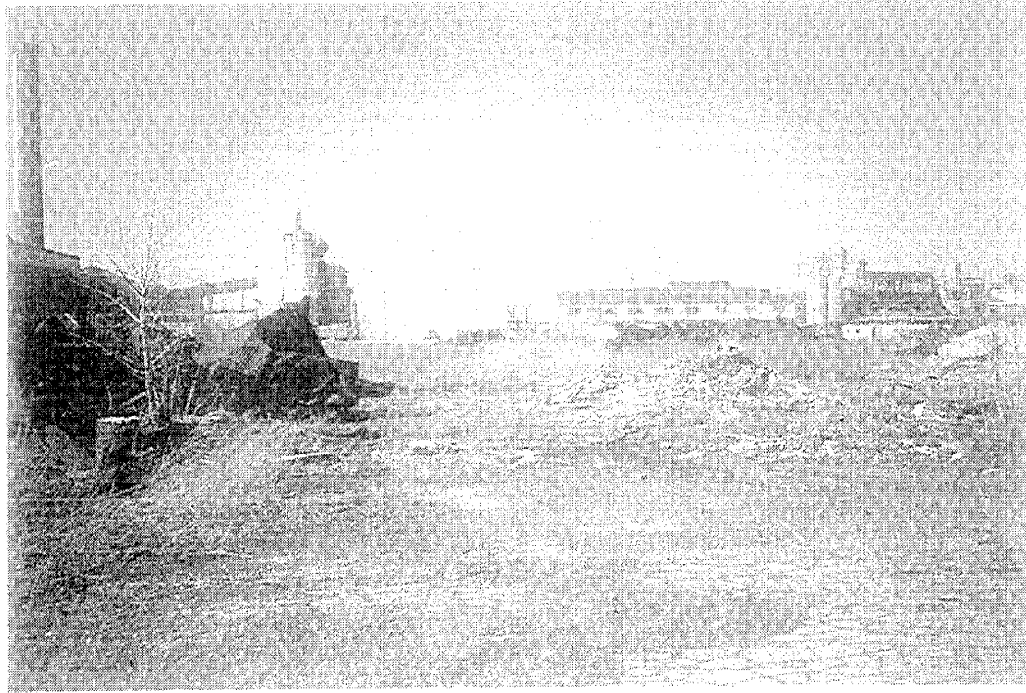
View of the Hazorb Site from the south end of the site, facing north
